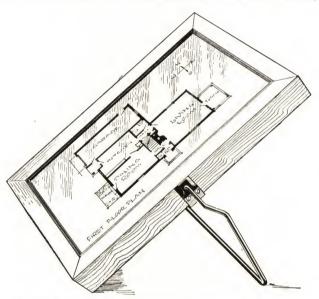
Blueprint Frame Showing How Tracing Appears in Frame
